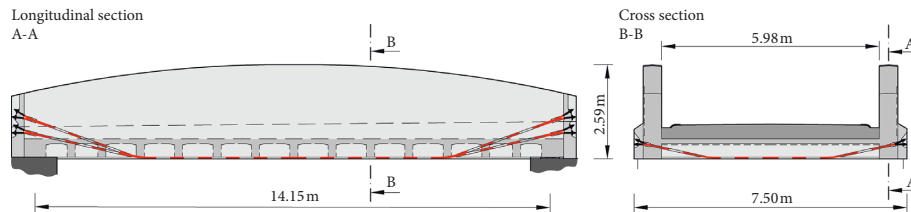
Another example of cable arrangement in the longitudinal and transverse directions for strengthening the U-shaped bridge with curved girders which was built in Vražné in 1928 according to project documentation [23].
